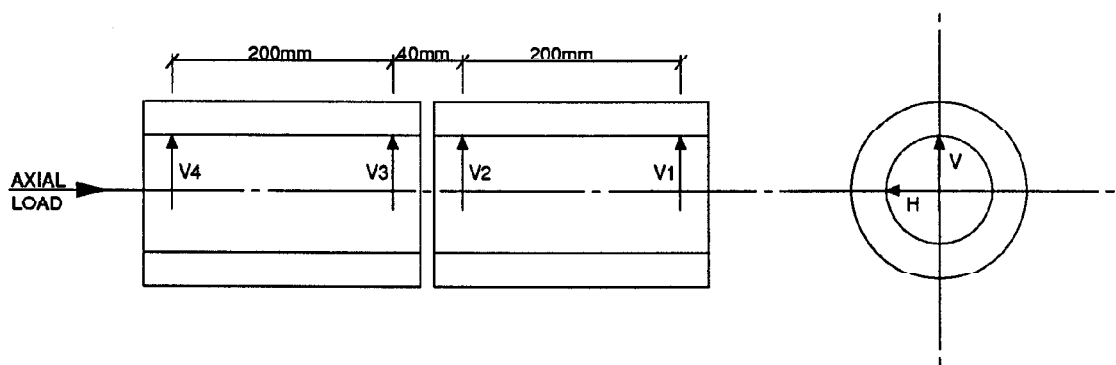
Positions of LVDT's measuring pipe alignment.
